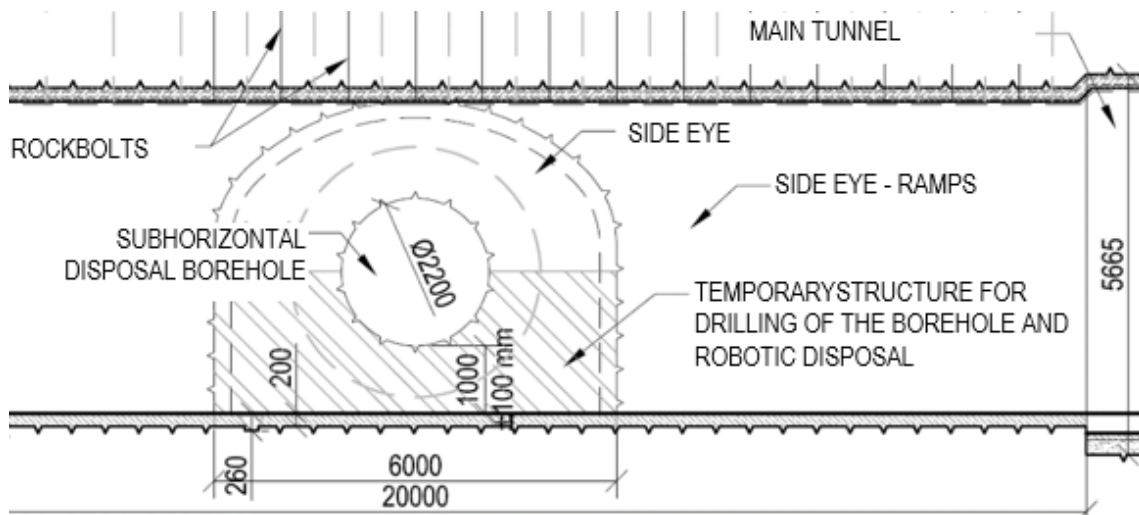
An example of horizontal disposal. Cross-section view from main tunnel – variant D4 – HD, C (Grunwald et al. 2018).
